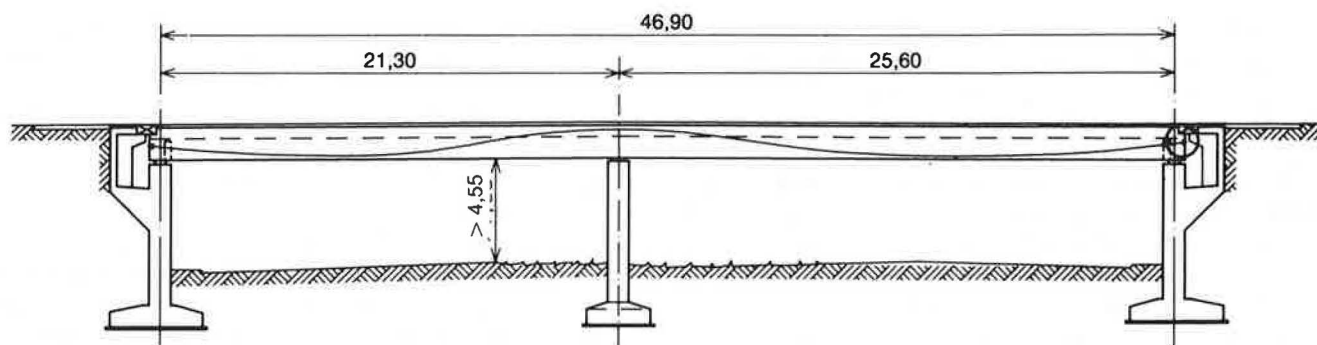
Ulenbergstrasse Road Bridge, Düsseldorf, longitudinal section.
